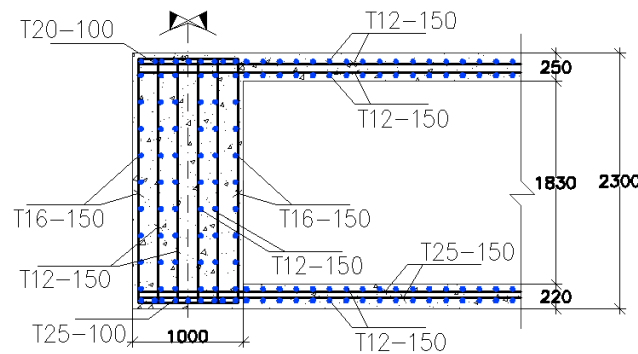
RC Bridge. Reinforcement details of the diaphragms at the left and right supports.
